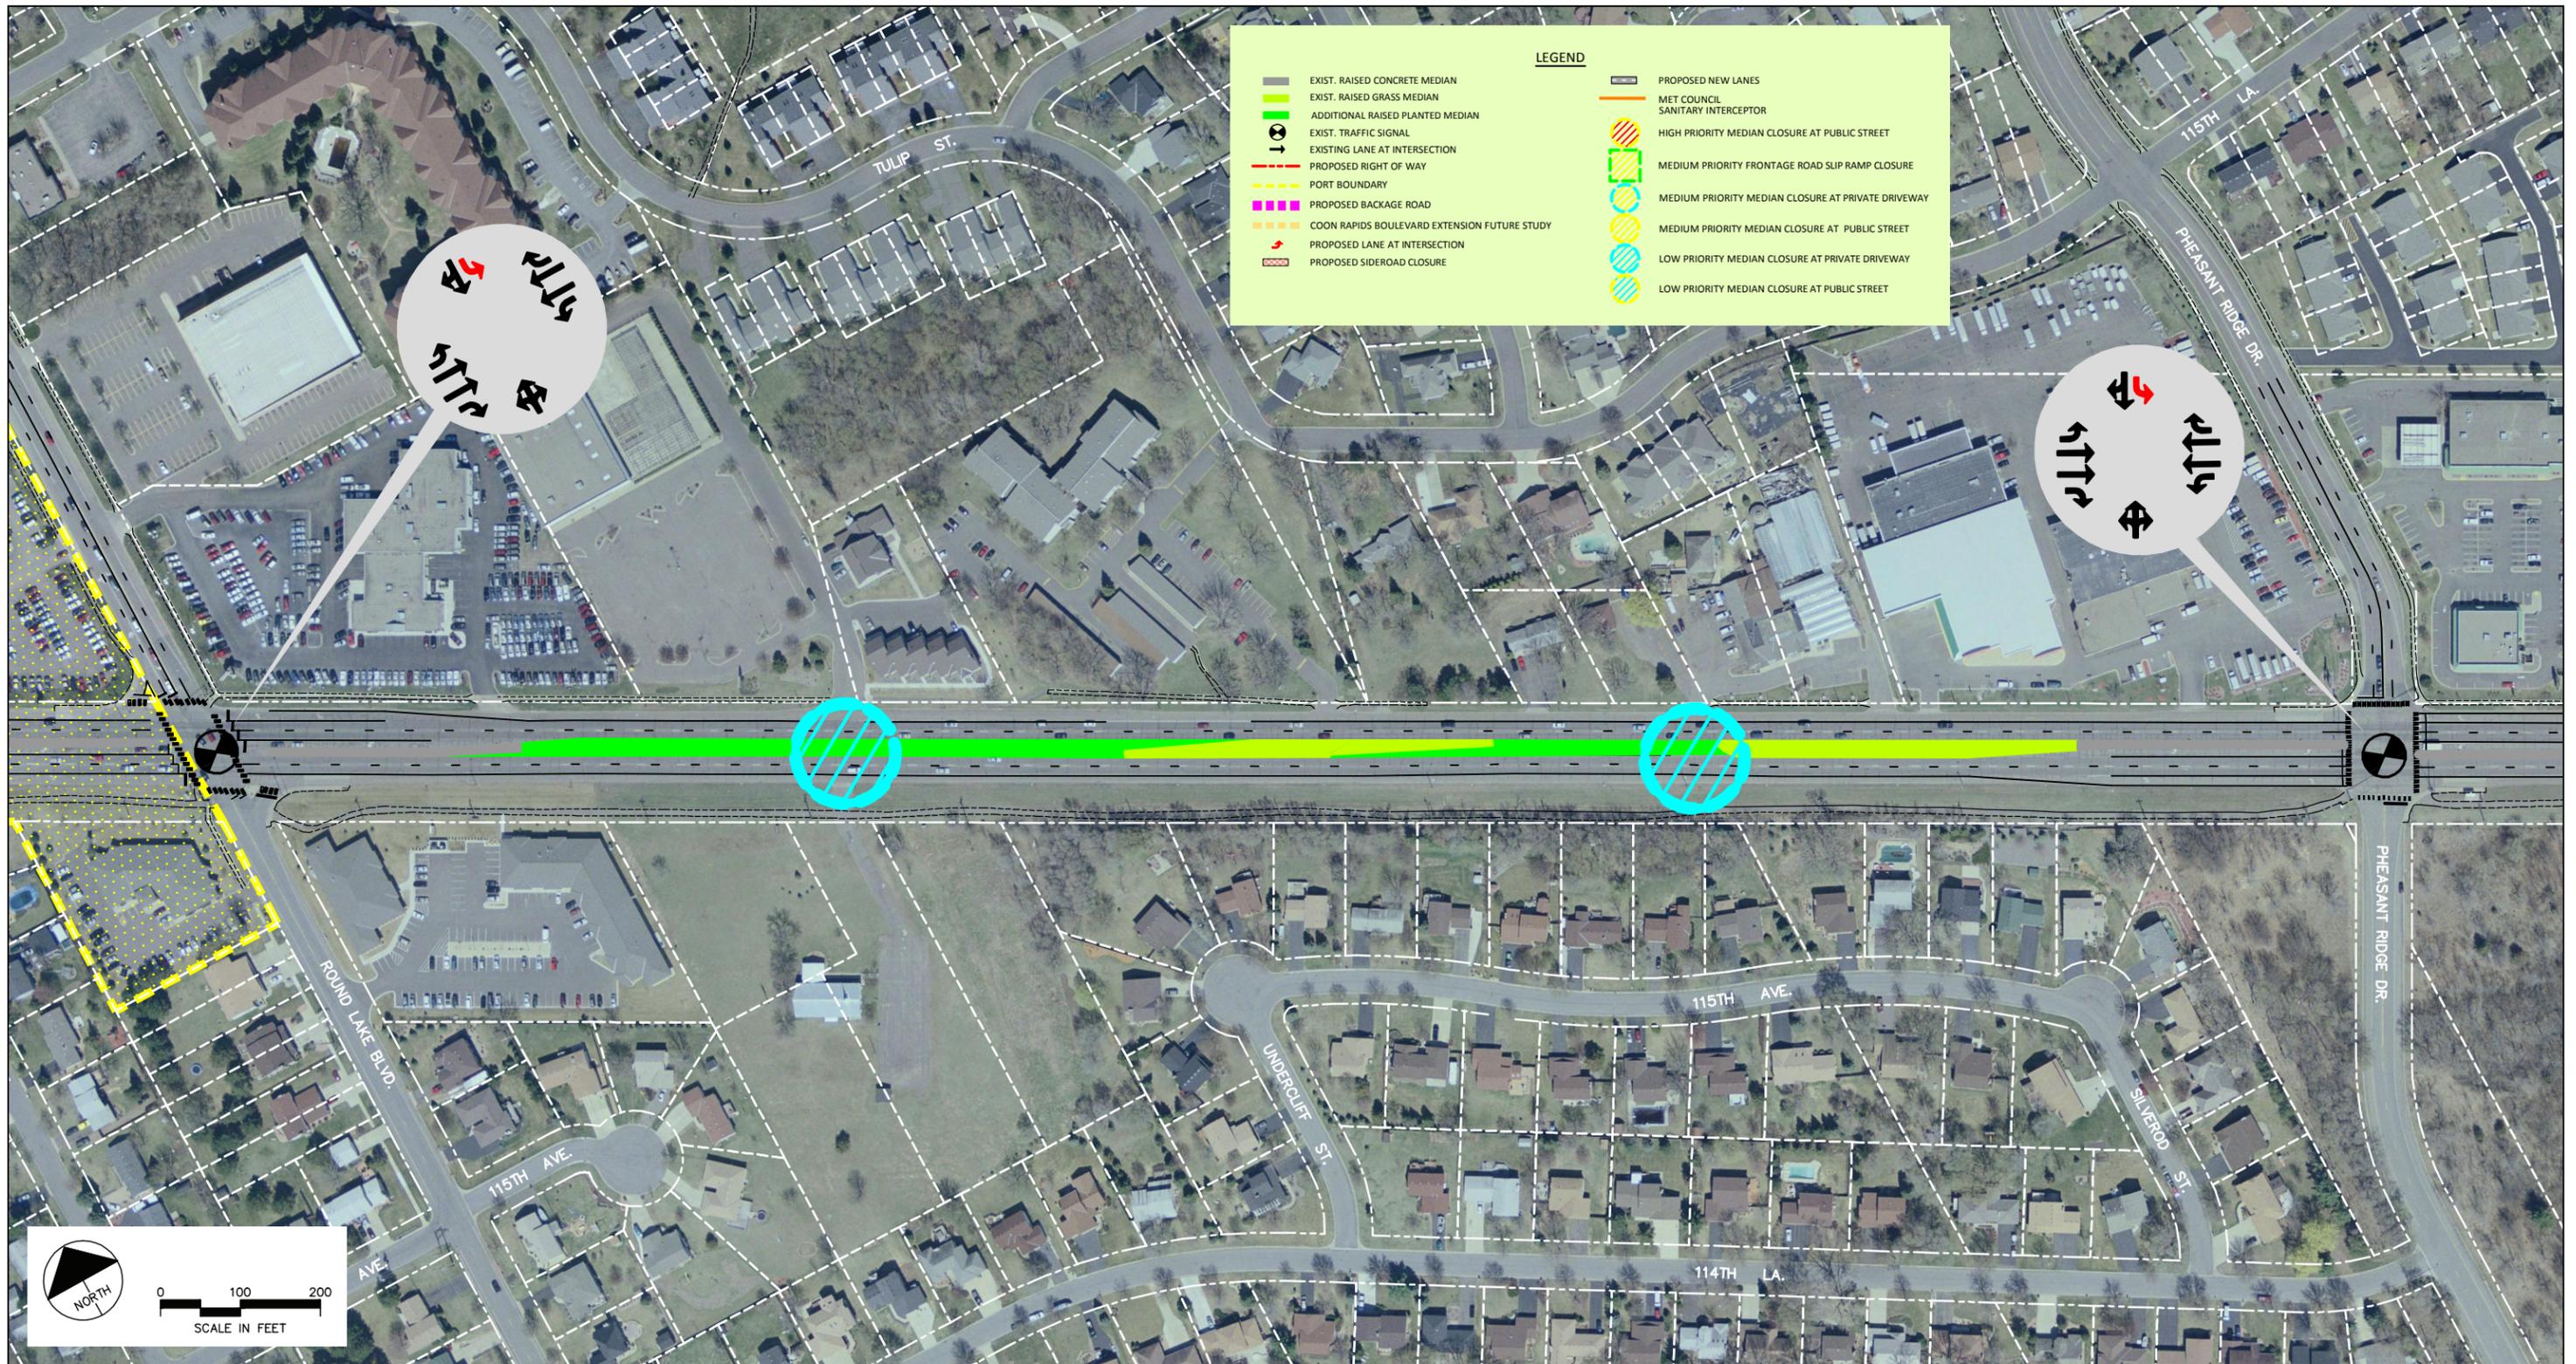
Proposed Roadway Recommendations Detail (3 of 15)
